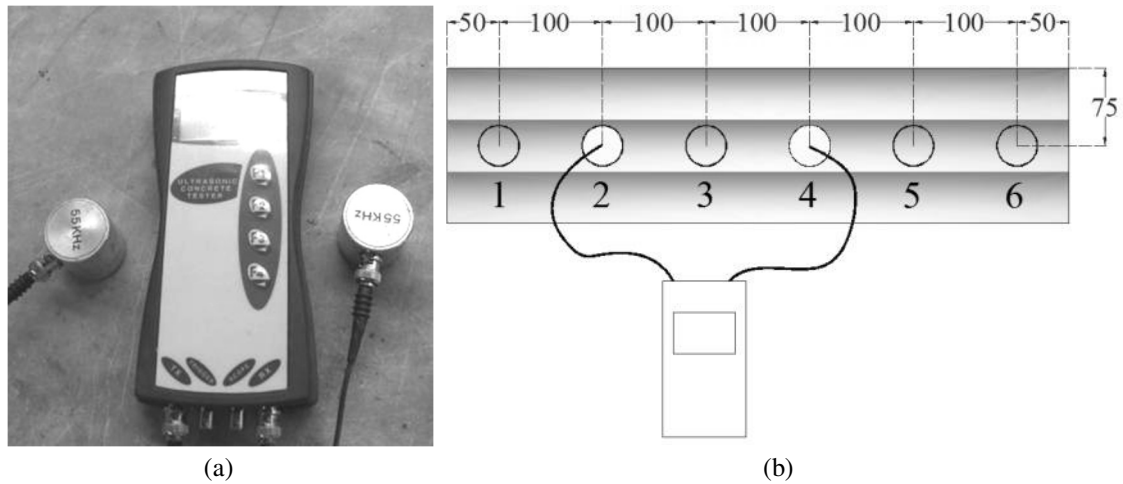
UPV measurements: (a) equipment used; (b) test setup (dimensions in mm).
